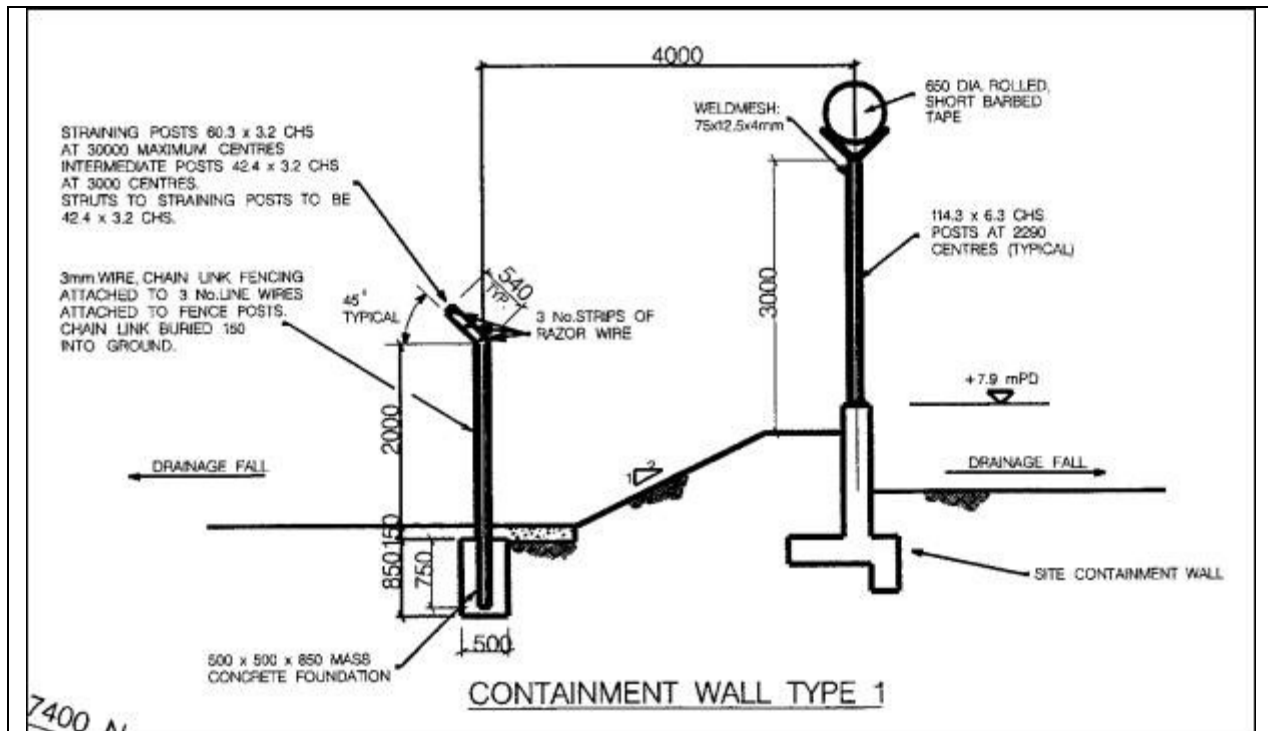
shows a typical cross section of the bund arrangement < Annex G-2 – EIA Report for Tung Chung - Ngong Ping Cable Car Project >
